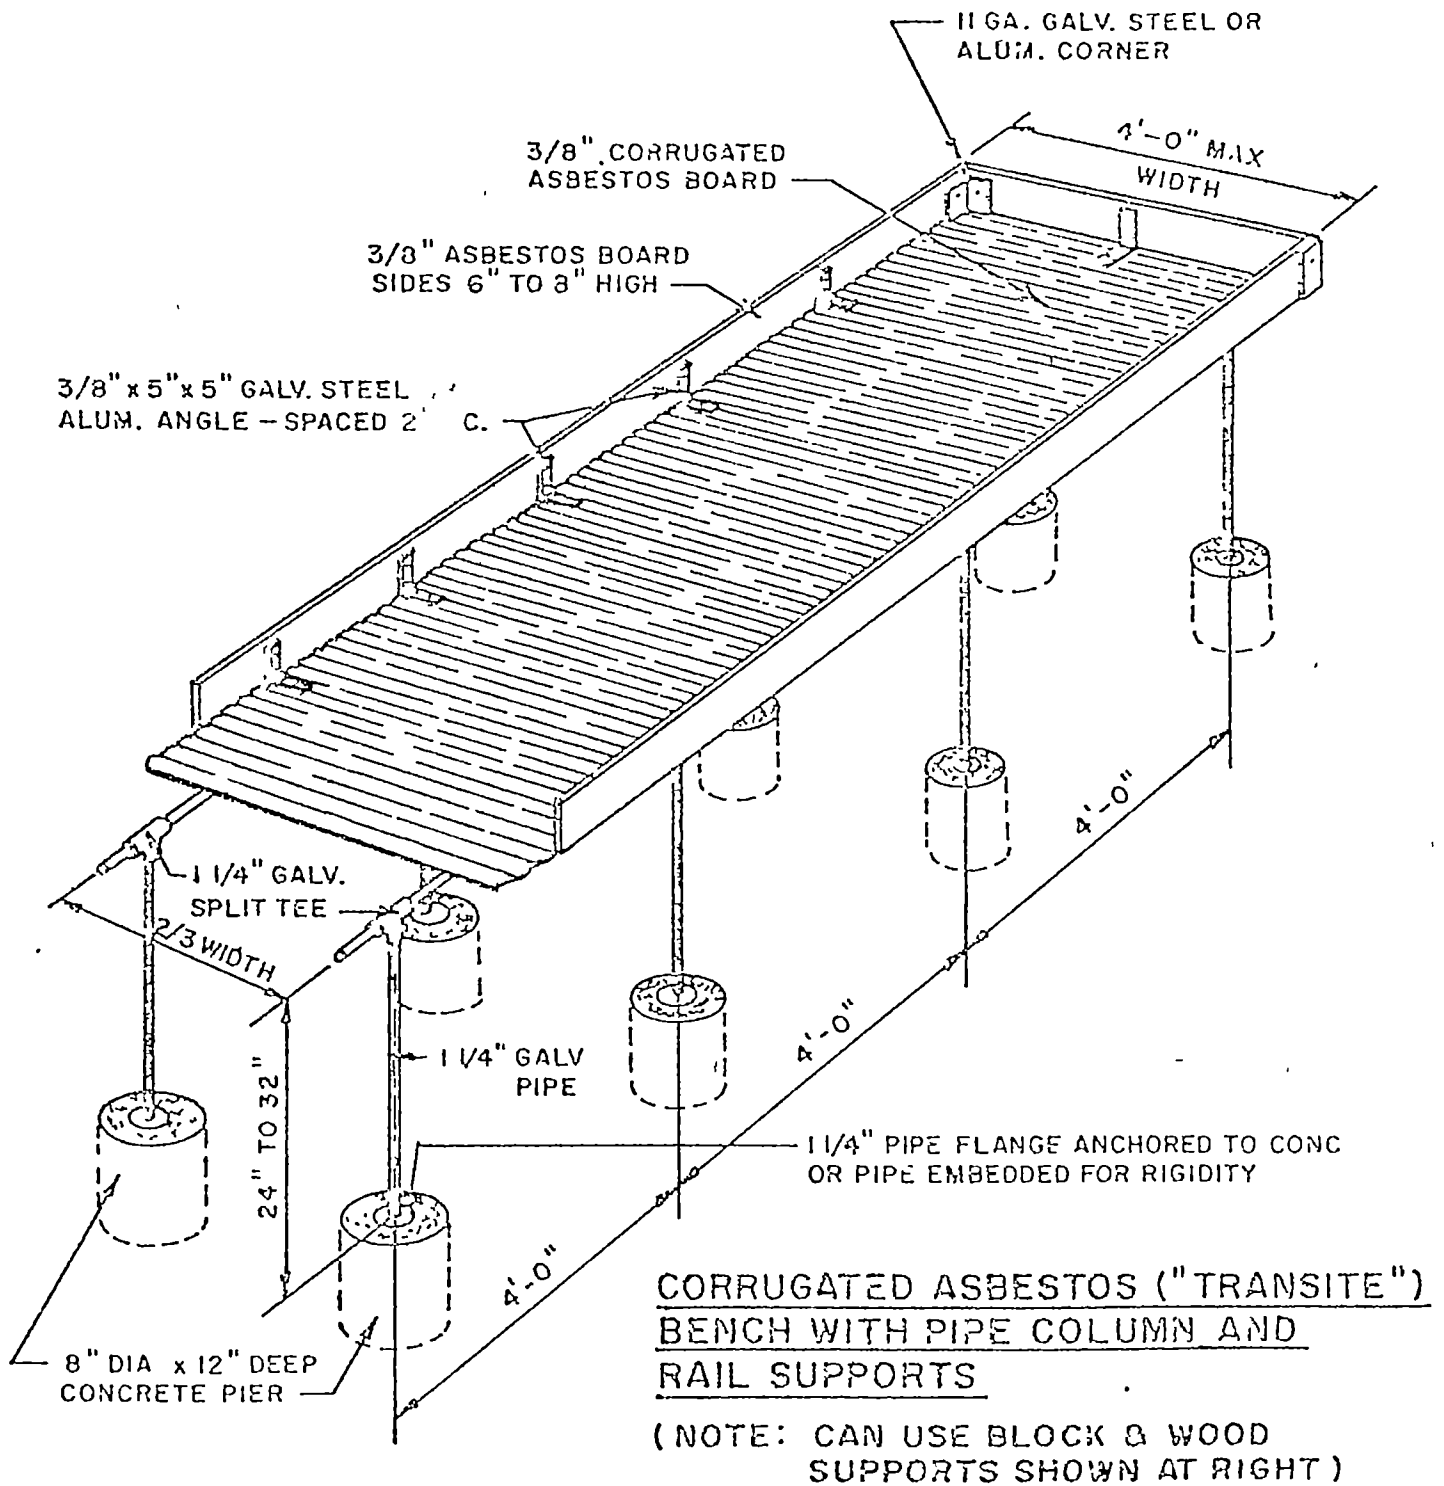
Corrugated asbestos ("transite") bench with pipe column and rail supports.
